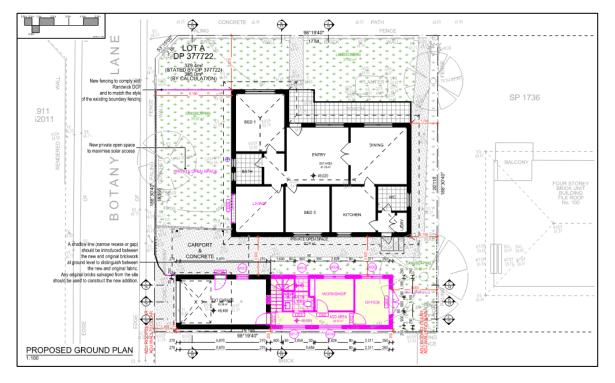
Proposed Ground Floor Plan (Source: Gardner Design & Drafting).
